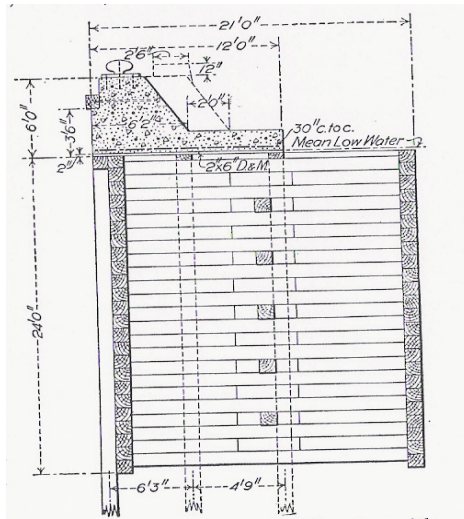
Cross-section of crib wall of sawn timber with upper portion of concrete, Duluth, Minn. USA 1909 [Greene 1917]
